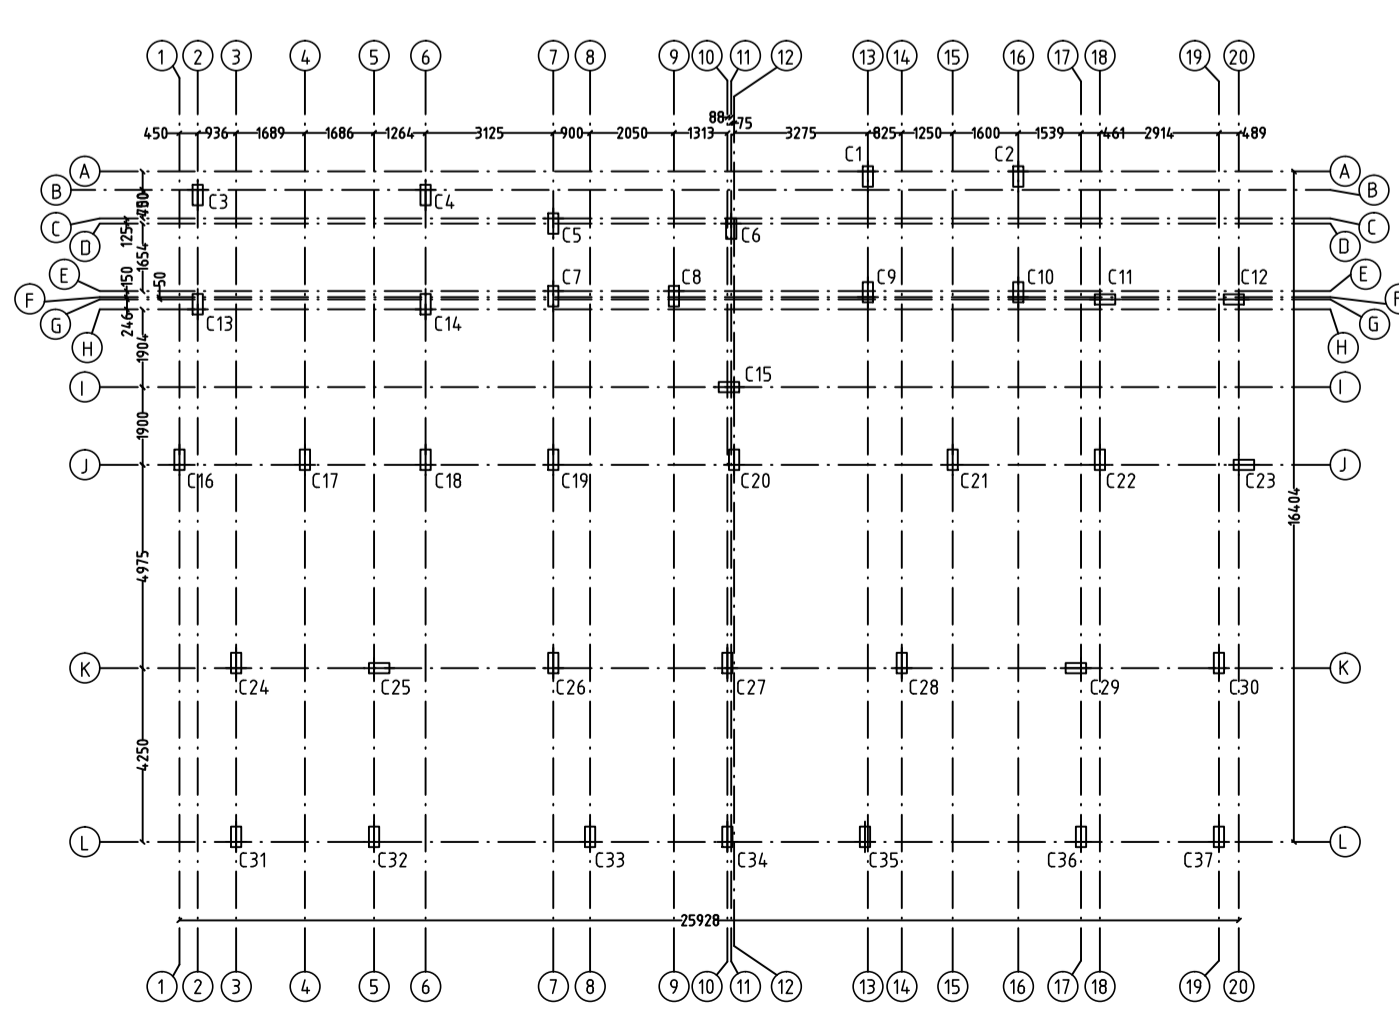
DETAILS OF R.C.C. COLUMN & FOUNDATION (F4)
